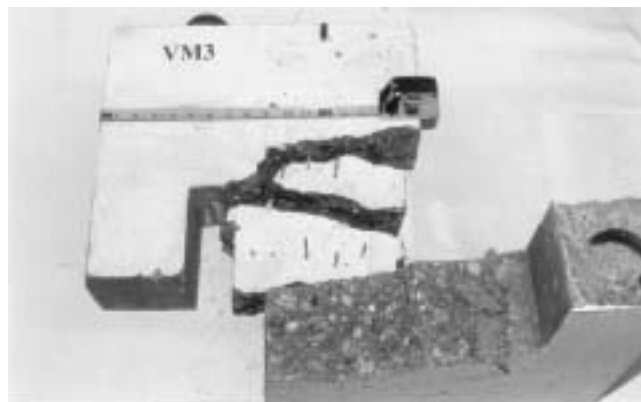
Typical failure mode and appearance of failure planes for monolithic specimens.
